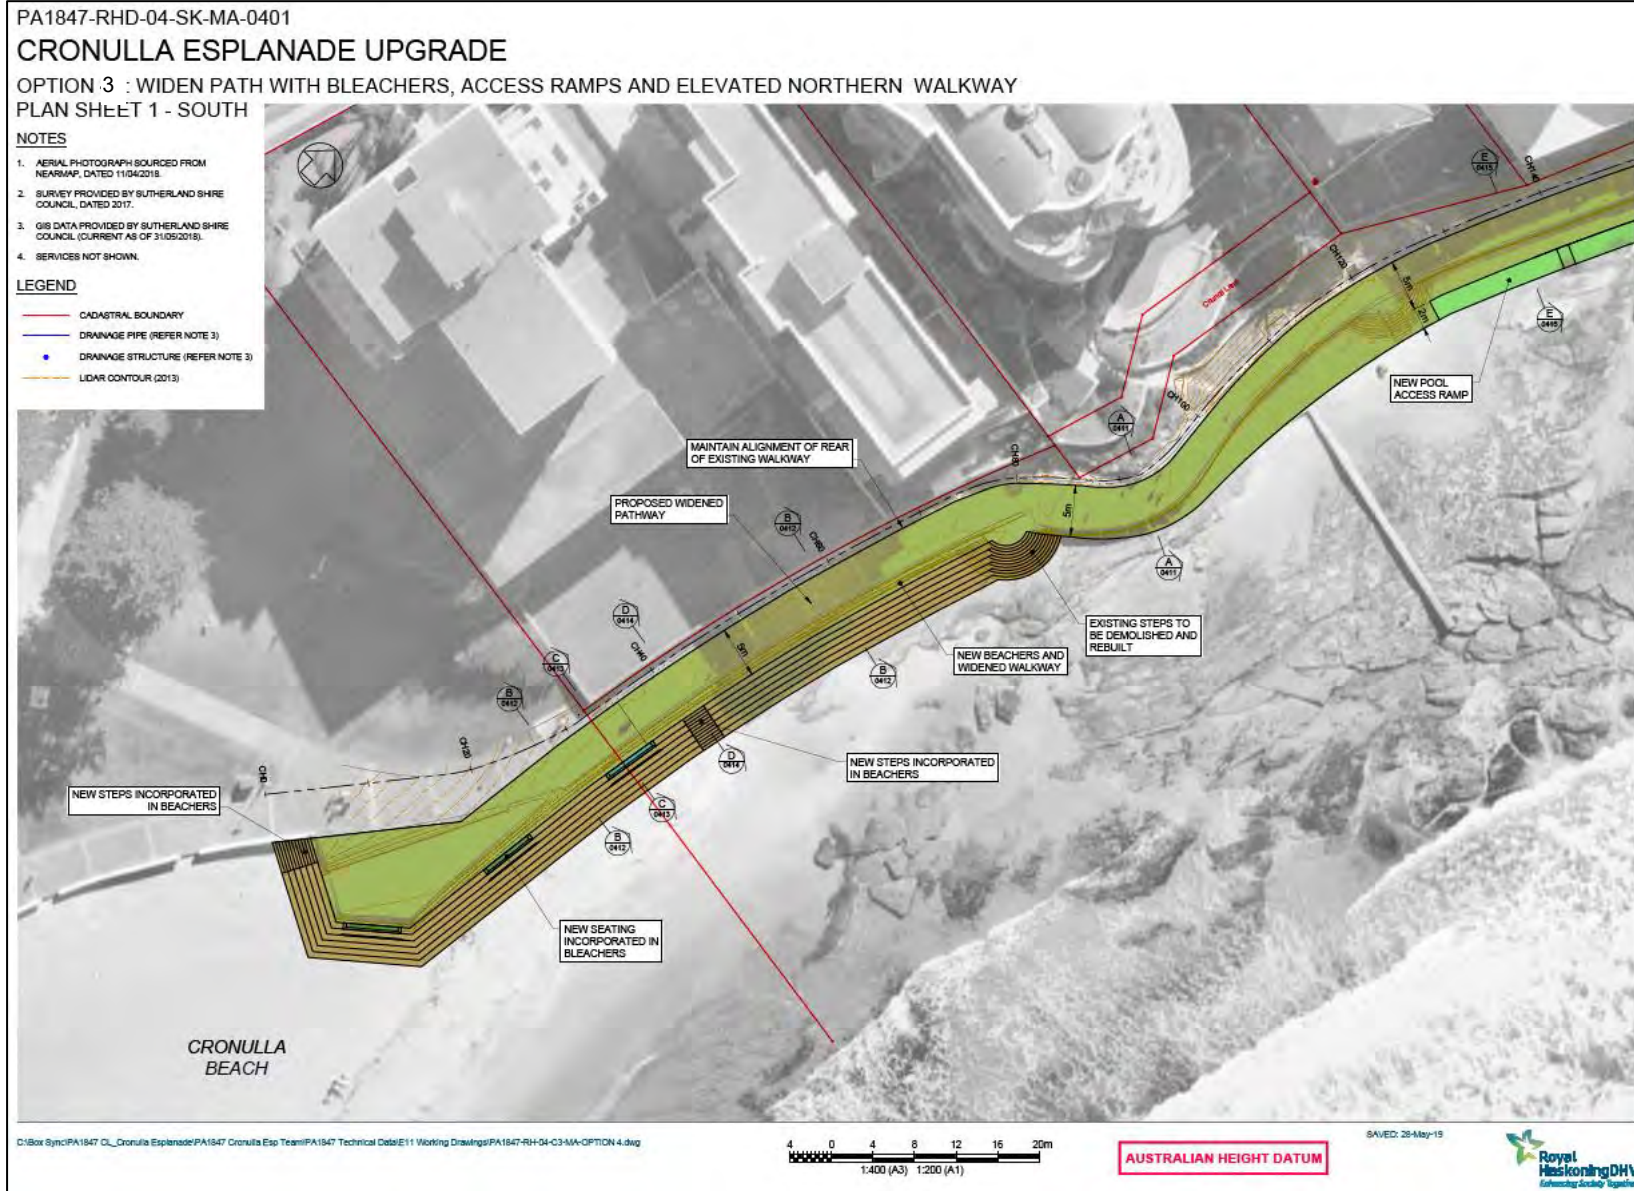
Option 3 - Widen Path with Bleachers, Access Ramps & Maintain Walkway Alignment – Southern Section
